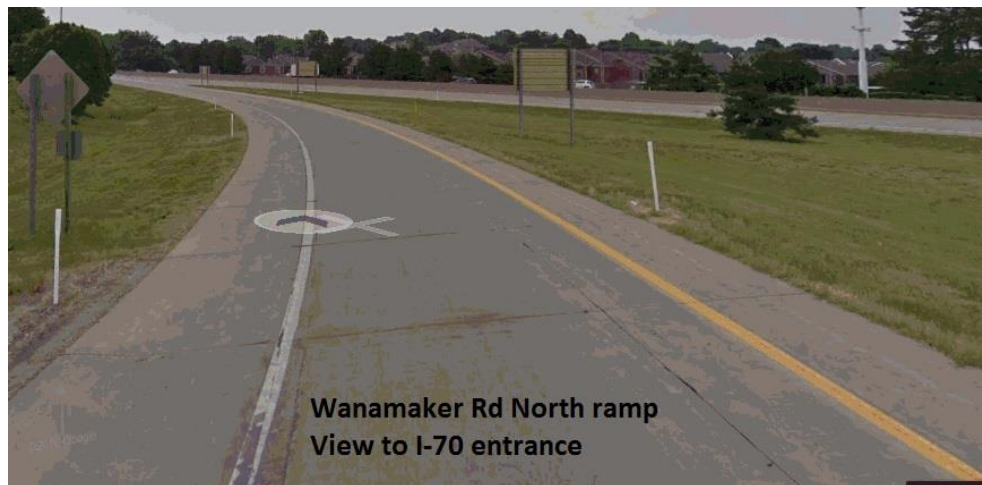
View from the Wanamaker Road North Ramp to the I-70 Entrance
